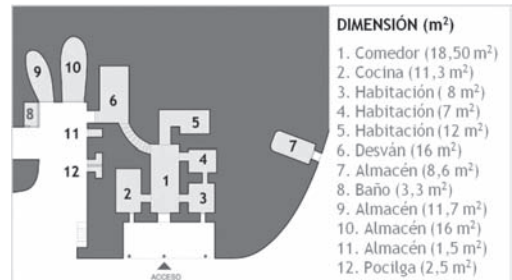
Main floor of an excavated house in the CAVE typology. Image of the author.
